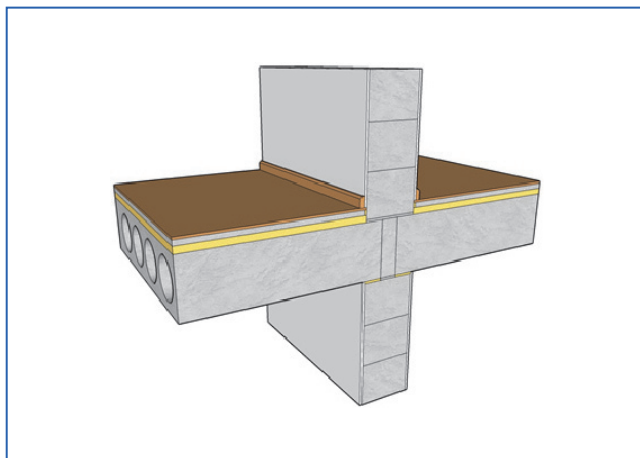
Massive wall structure and concrete floating floor on hollow-core panels.
